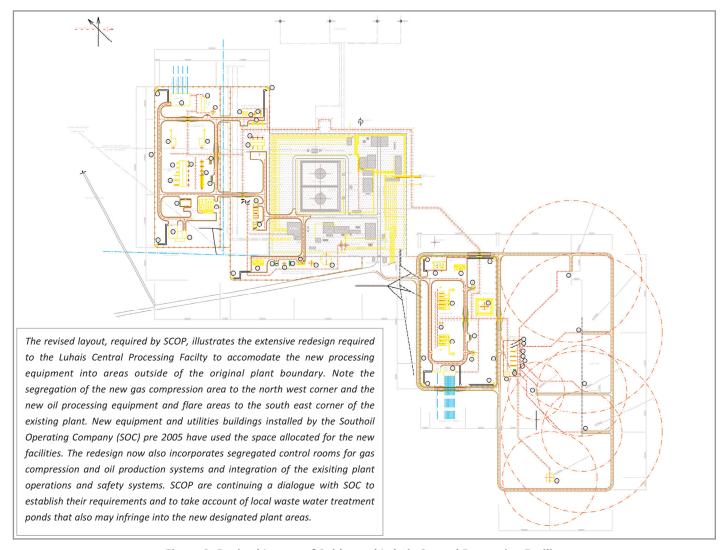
Revised Layout of Subba and Luhais Central Processing Facility
